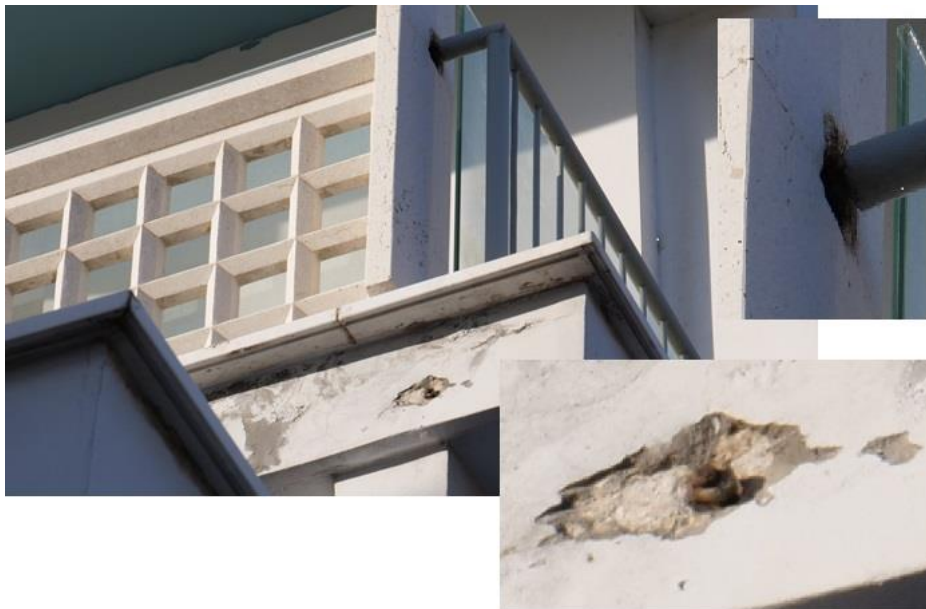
Reinforcement and other embedded metal corrosion causing local concrete spalling
